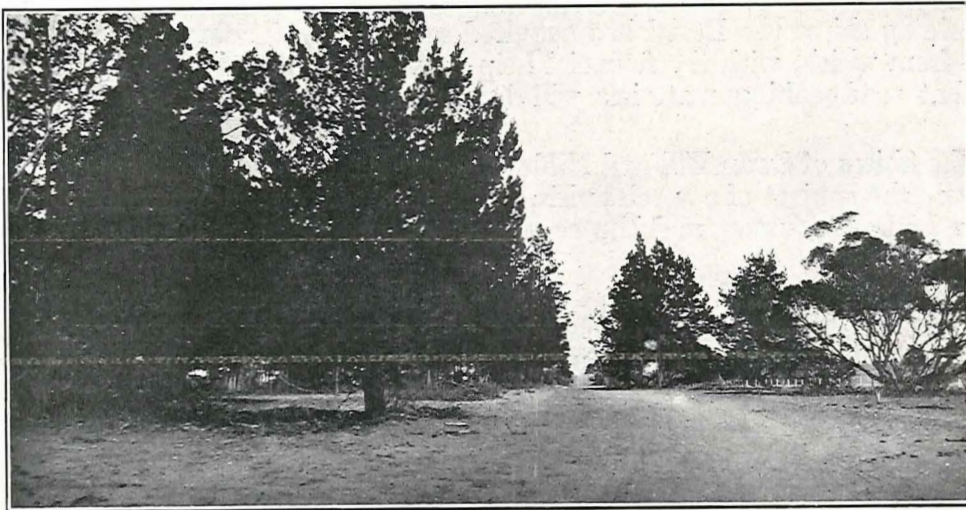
Showing good road on natural surface at Walpeup, Ouyen-Pinnaroo Road.
